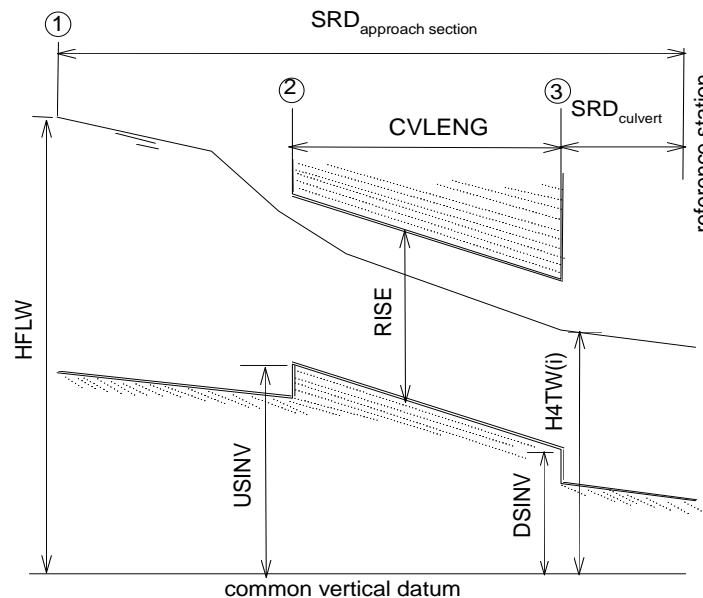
Distance and elevation relations between the culvert and approach section. [Approach section, 1; culvert inlet section, 2; culvert exit section, 3; HFLW, approach section water-surface elevation; USINV, culvert inlet invert elevation; DSINV, culvert outlet invert elevation; H4TW(i), tailwater elevation; RISE, culvert height; CVLENG, culvert length; $SRD_{\text{approach section}}$, section reference distance for approach section; SRD_{culvert} , section reference distance for culvert outlet]
